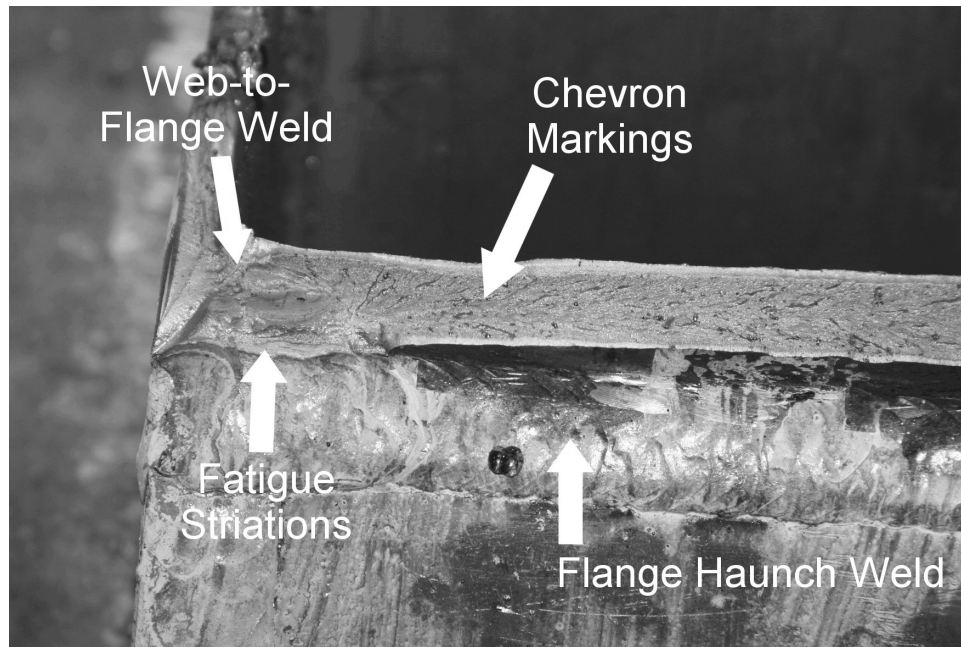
Fatigue Striations and Chevron Markings in Fracture Surface of Specimen X3L1.6
